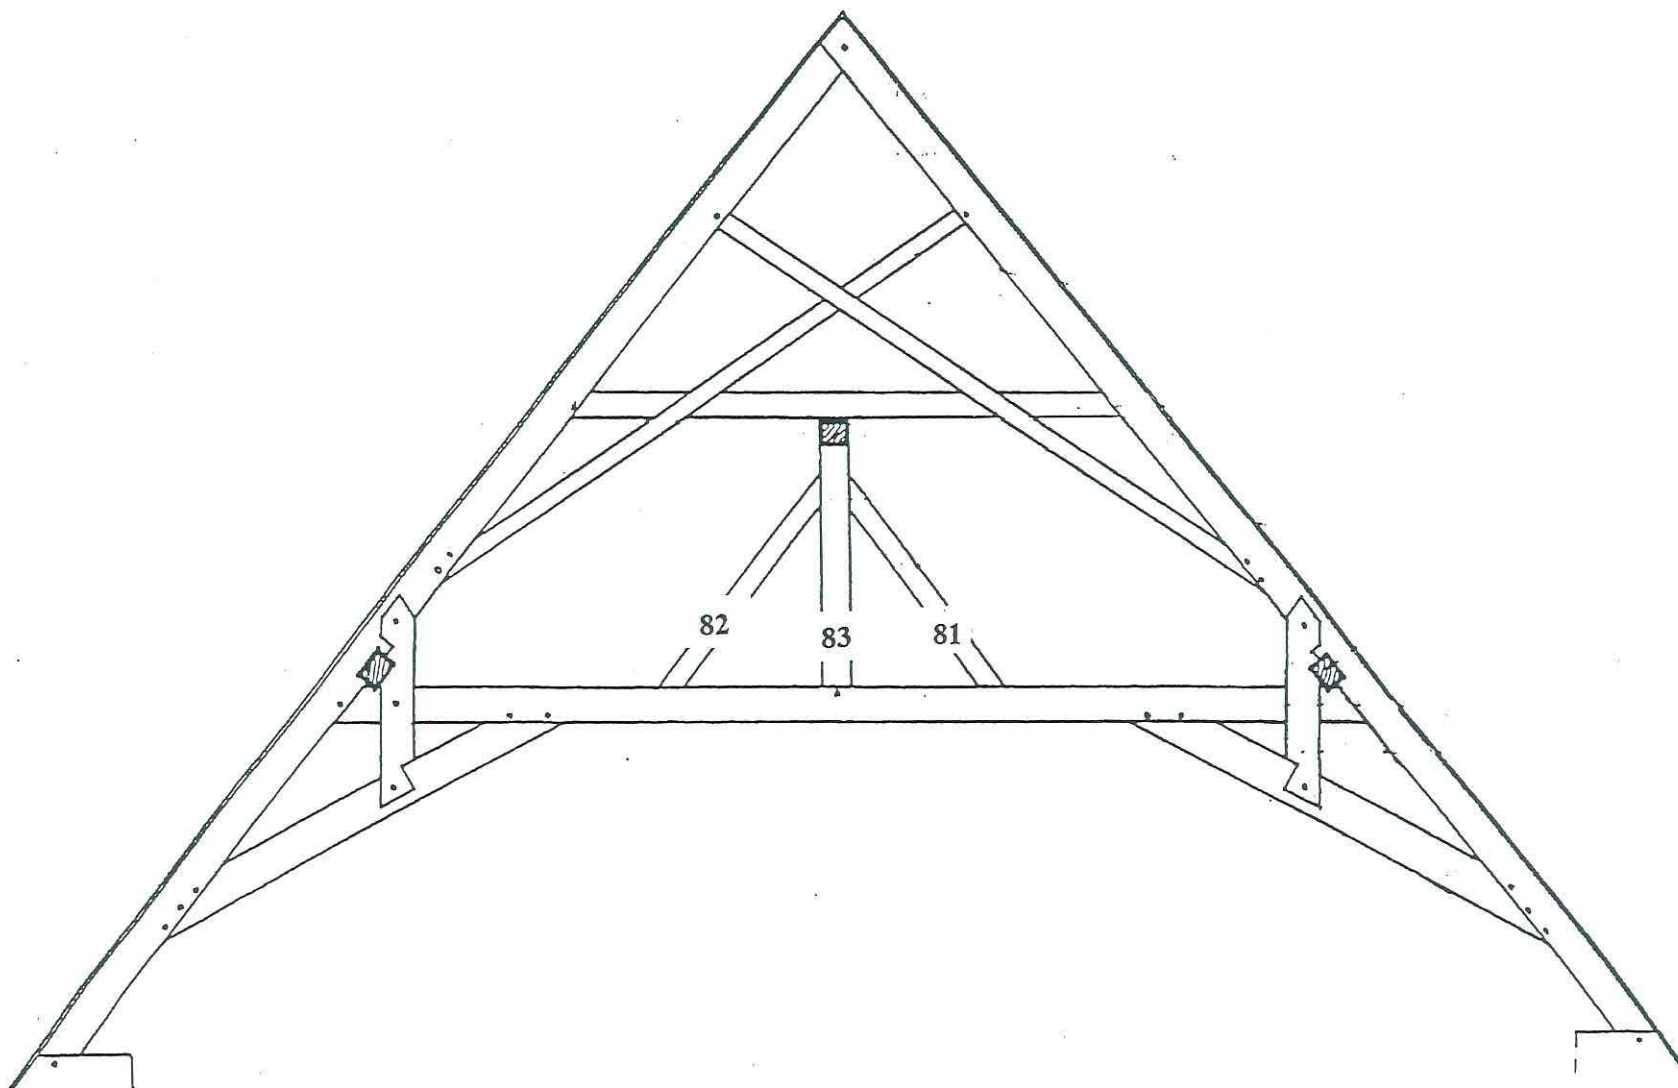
Drawing of frame 66 of the Choir and crossing, viewed from the east, to show sample locations
